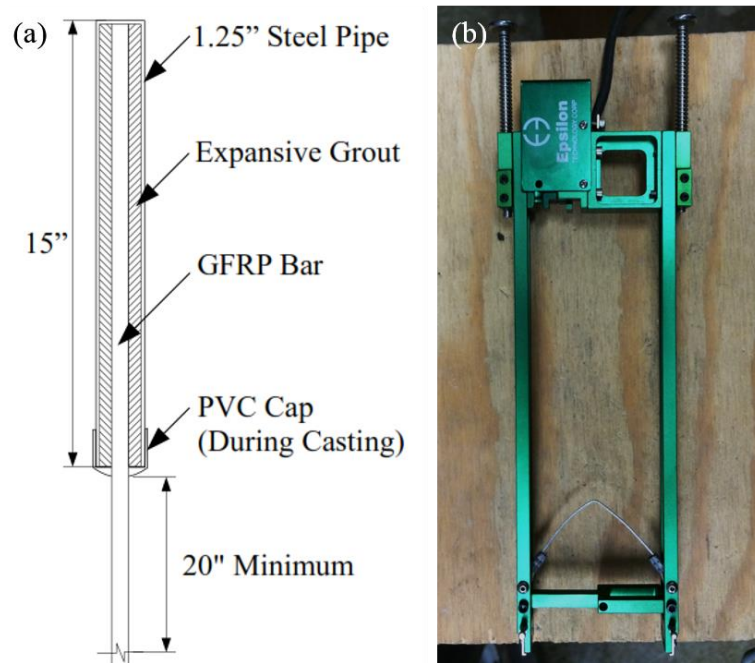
GFRP Tension Specimen: (a) Anchor Details; (b) Extensometer
